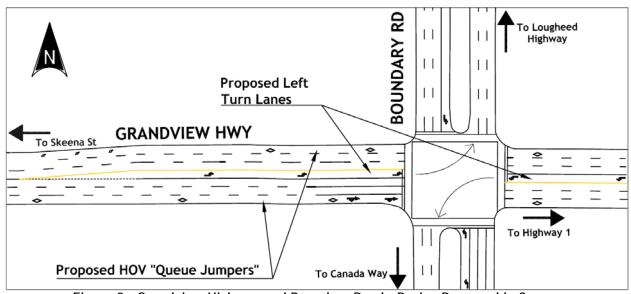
Grandview Highway and Boundary Road - Design Proposed in Survey
